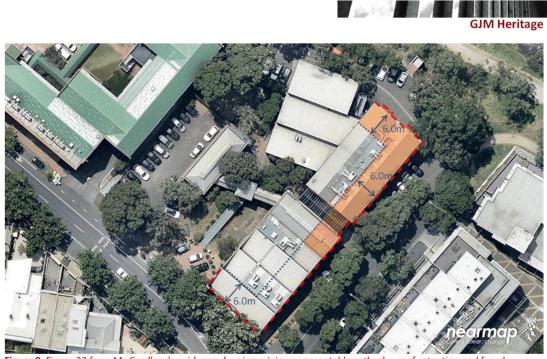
Figure 23 from Mr Gard'ner's evidence showing minimum acceptable setbacks, roof retention and façade retention (including the 1984 link structure and projecting elements on Yarra River elevation of the 1920s factory building)
